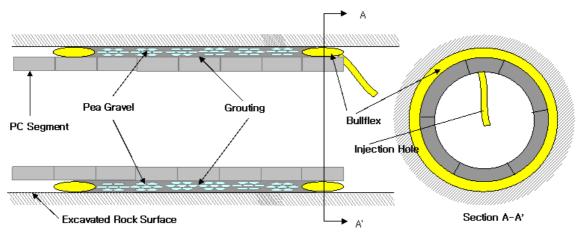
Bulfllex and Backfill Grouting for Cut-Off of Water
